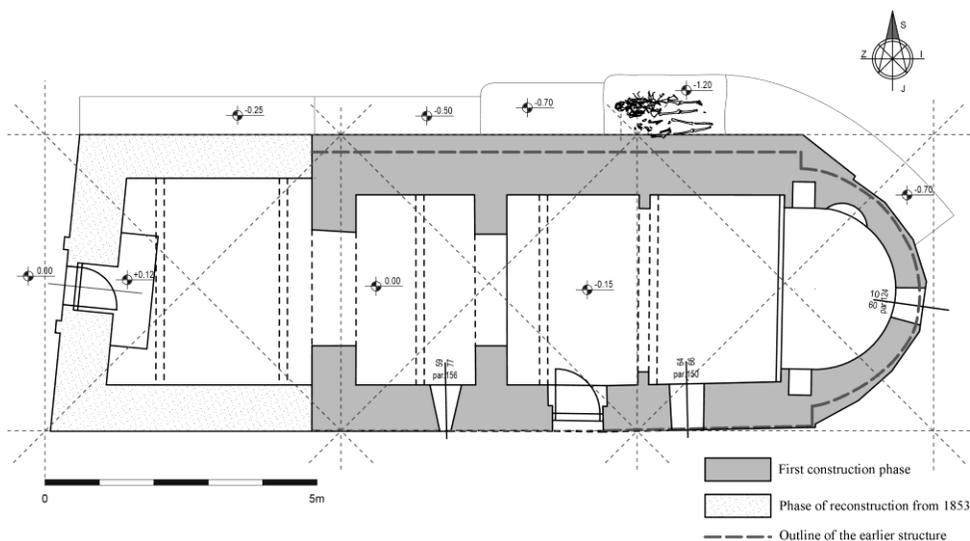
Plan of the existing and older church with uncovered graves (drawing by M. Slavković)
